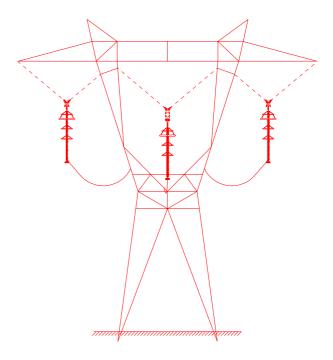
Planned installation of polymer-housed arresters in a typical 800 kV tower. Arrester rated voltage 588 kV.
